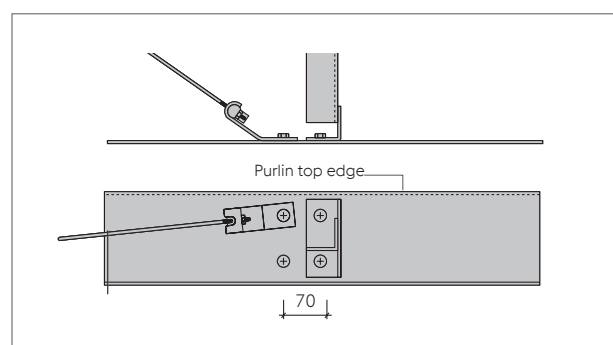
Detail of joining a strut and a diagonal tie to the purlin in an end braced bay
